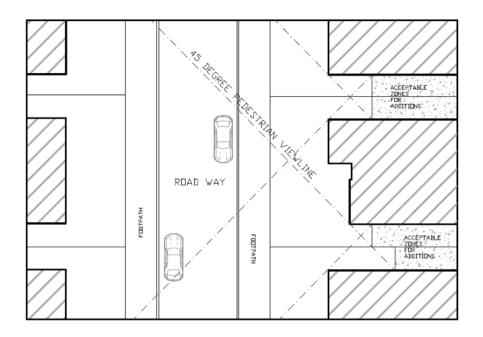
acceptable areas for ground level additions are sited within the area created by drawing a 45 degree view line from the opposite footpath through the front corner of the subject building and the corners of adjacent buildings.
